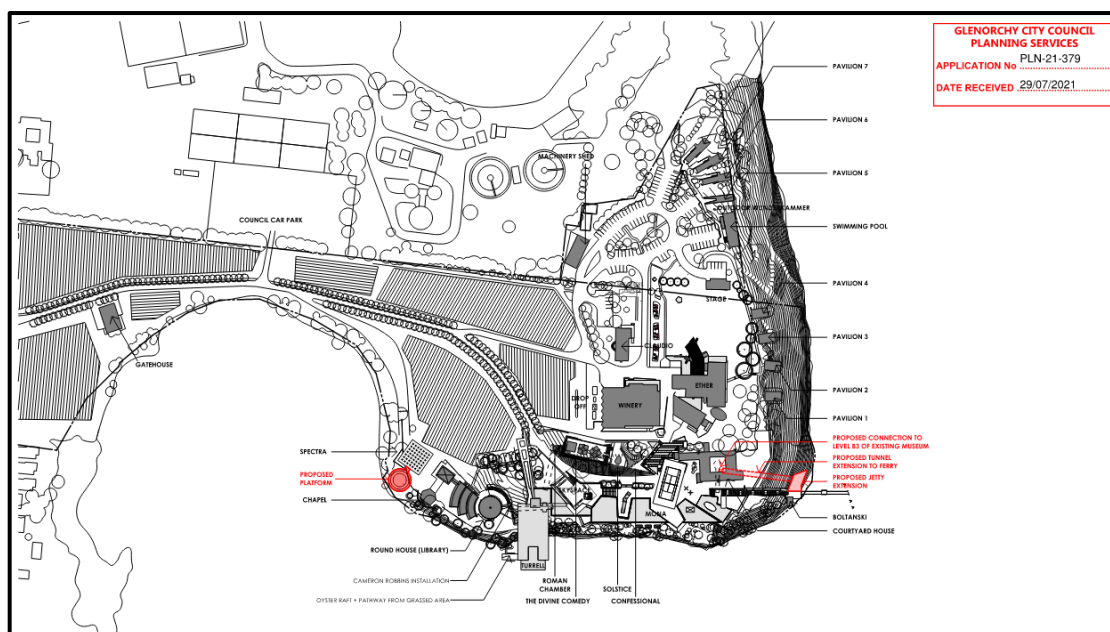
Site Plan for 651-655 Main Road, Berriedale.
